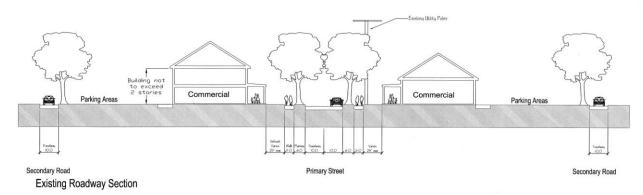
A.1. Illustrative Existing Road Cross Section
